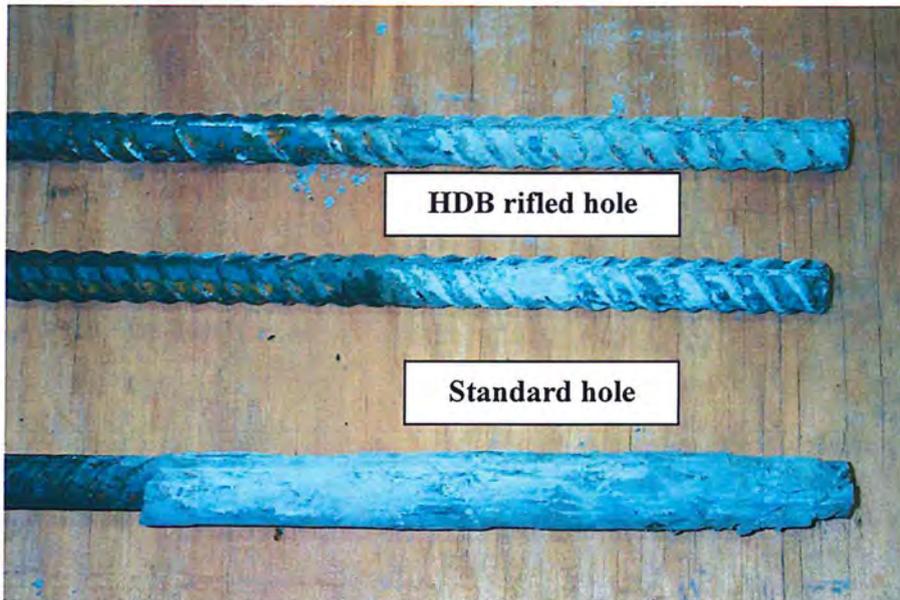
Bolts installed in rifled boreholes caused grout failure while bolt installed in standard borehole (bottom) exhibited anchor failure in the same type of material
